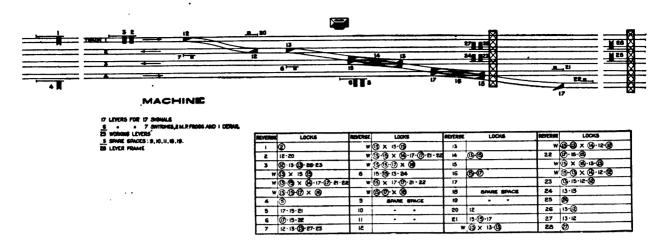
Interlocking Plan and Locking Sheet, Crossovers and Turnouts on Four-Track Road.
